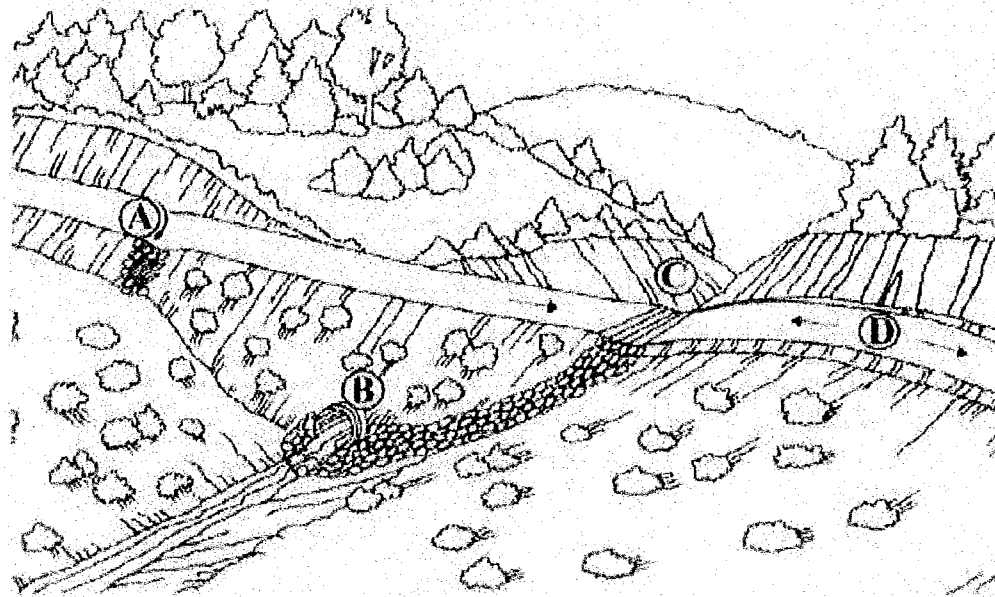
Critical dips or dipped crossing fills should be centered near a stream crossing's down-road hinge line, not over the centerline of the crossing where overtopping could cause washout or severe erosion of the fill. If the stream crossing culvert (B) plugs, water will pond behind the fill until reaching the critical dip or low point in the crossing (C) and flowing back down into the natural stream channel. The down-road ditch must be plugged to prevent streamflow from diverting down the ditch line. For extra protection in this sketch, riprap armor has been placed at the critical dip outfall and extending downslope to the stream channel. This is only required or suggested on stream crossings where the culvert is highly likely to plug and the crossing fill overtopped. The dip at the hinge line is usually sufficient to limit erosional damage during an overtopping event. Road surface and ditch runoff is disconnected from the stream crossing by installing a rolling dip and ditch relief culvert just up-road from the crossing (A) (Keller and Sherar, 2003).
